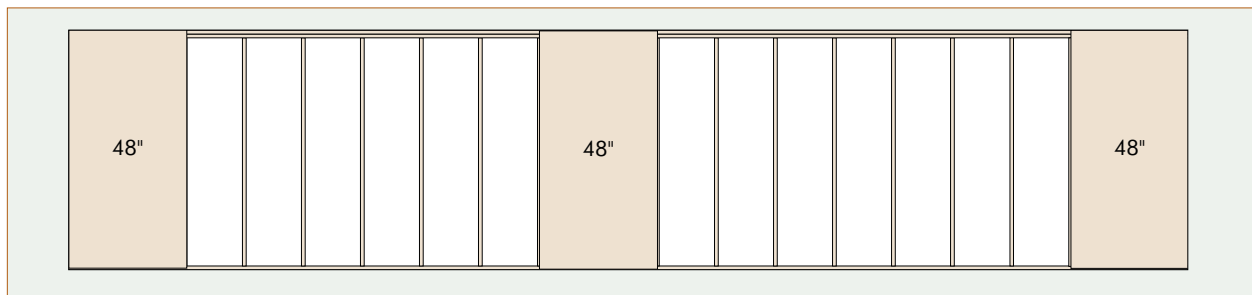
Panel layout detail of west wall used for all tests described in this report.
